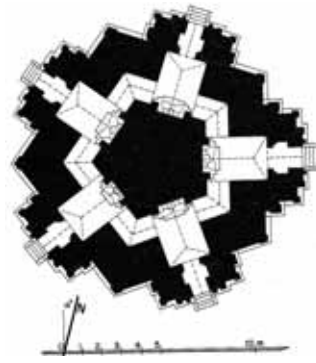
Ground floor plan of Nga-Myet-Hna temple (Monument no. 607)
